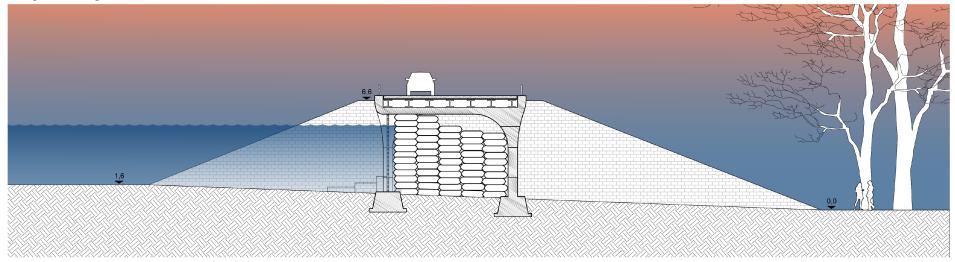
Technical sections of the gabion dike in the dry season and during a flood event
